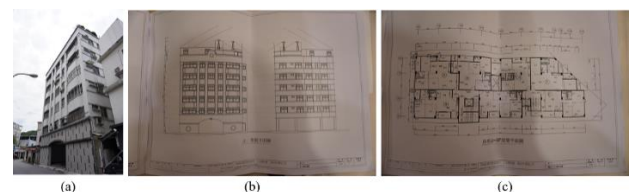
(a) street view, (b) elevation view, and (c) plan view of Building S03.
